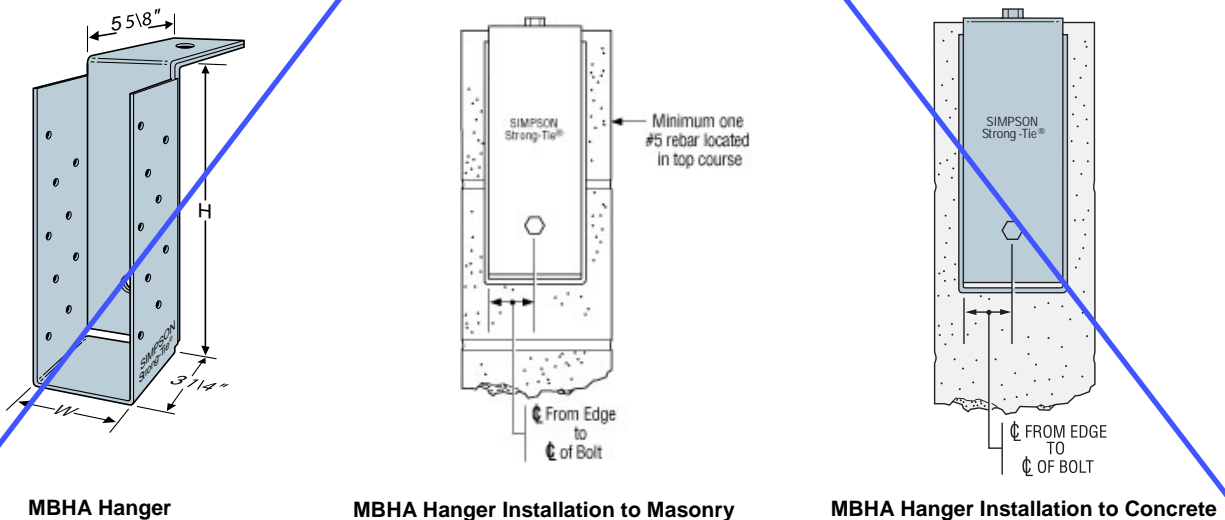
MBHA SERIES WOOD BEAM HANGERS SUPPORTED BY CONCRETE OR MASONRY CONSTRUCTION
